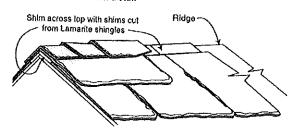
TYPICAL HIP AND RIDGE SHINGLES
